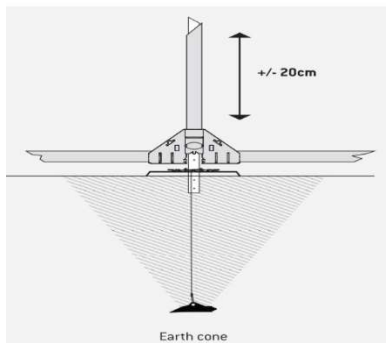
The ground anchoring system, (UNHCR and IKEA, 2016)
